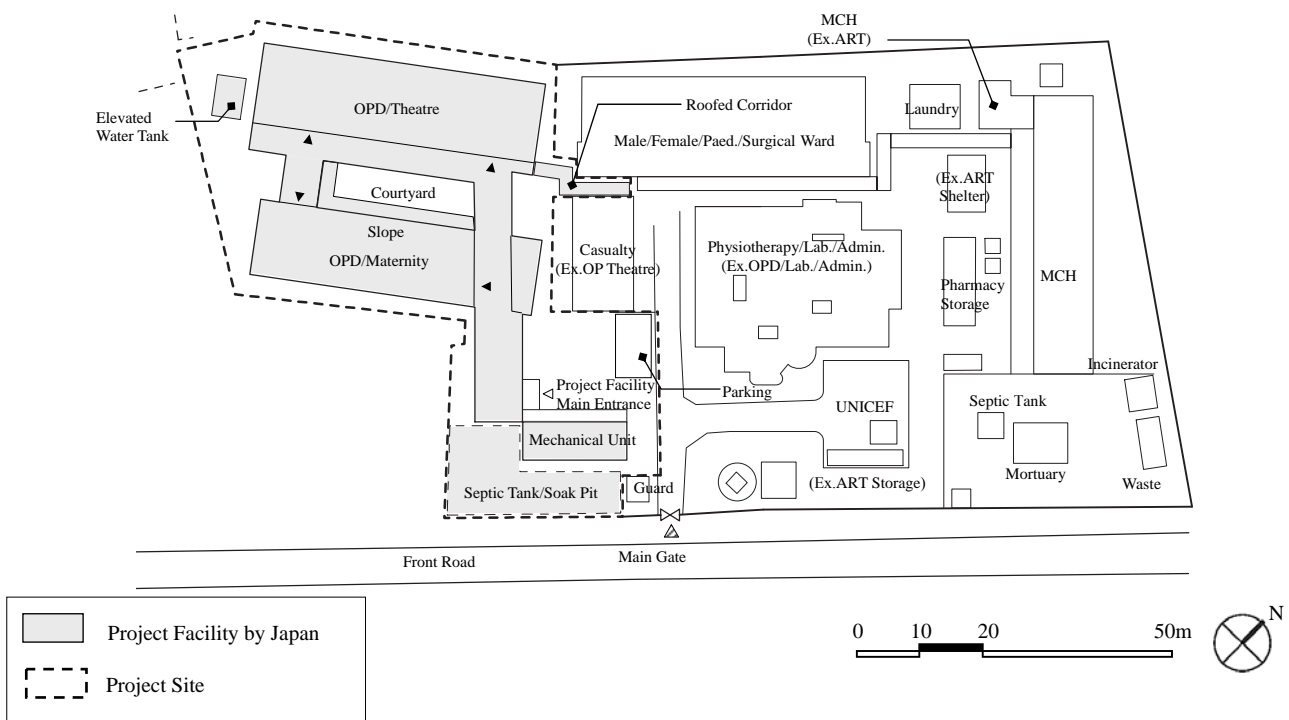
Existing facilities and the Layout Plan of Chipata Lv1H Project Facilities
